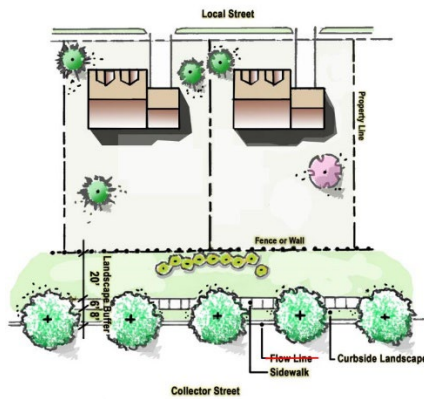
Collector Street Frontage Buffer Measurement Detached Straight Walk
